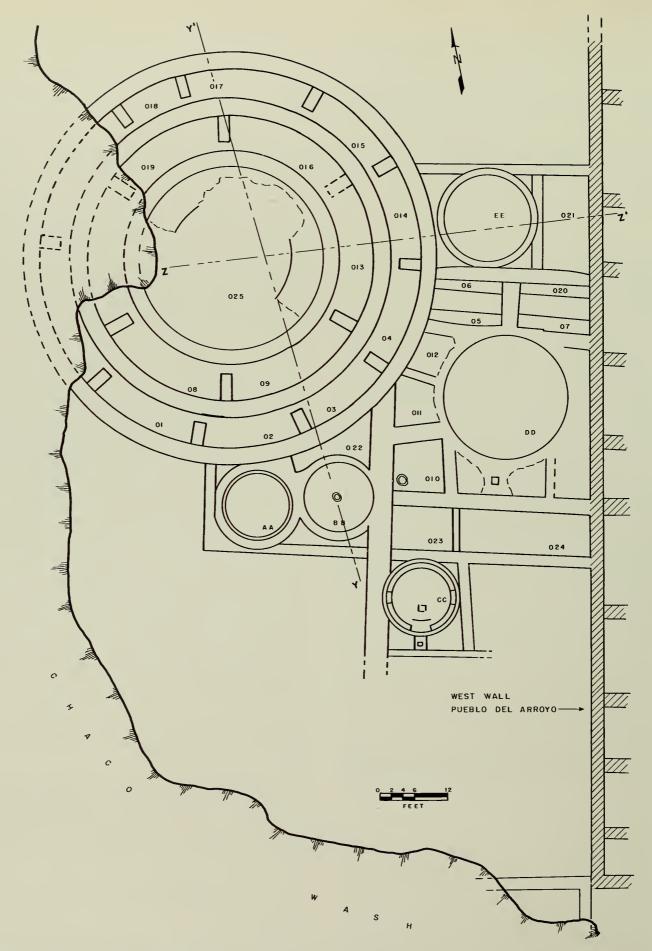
Ground plan of the triple-walled structure at Pueblo del Arroyo. The Tri-wall group is attached to the west exterior wall of Pueblo del Arroyo and lies between it and the Chaco Wash.
